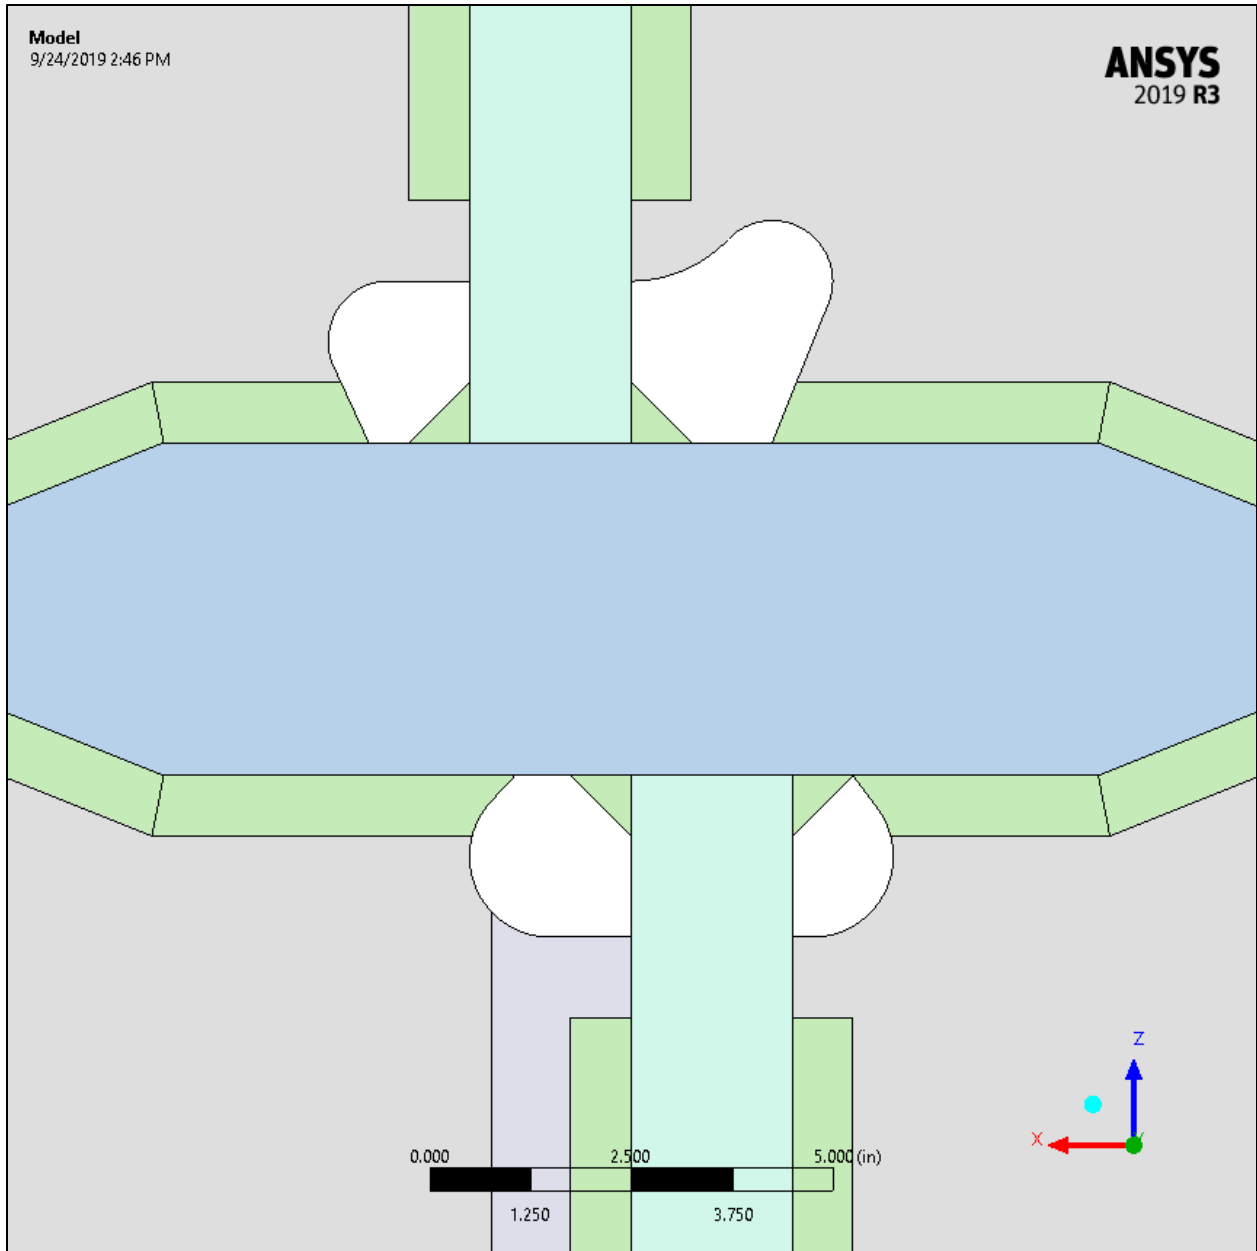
Plan view of modeled access holes on First Street South (“F”) girder. North is towards the top of the page.
